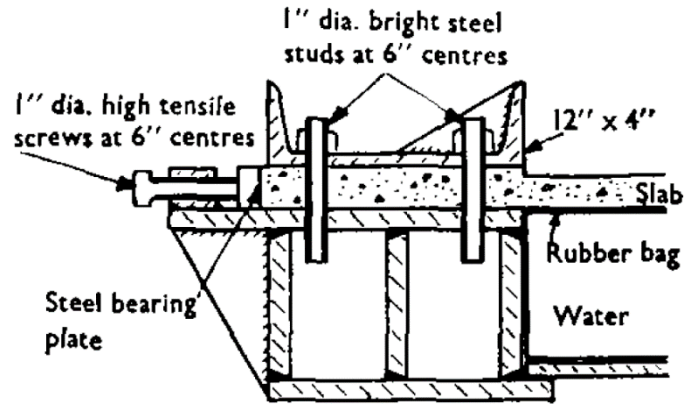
Floor slab with fully fixed edge. (From Park et al. (1964))
